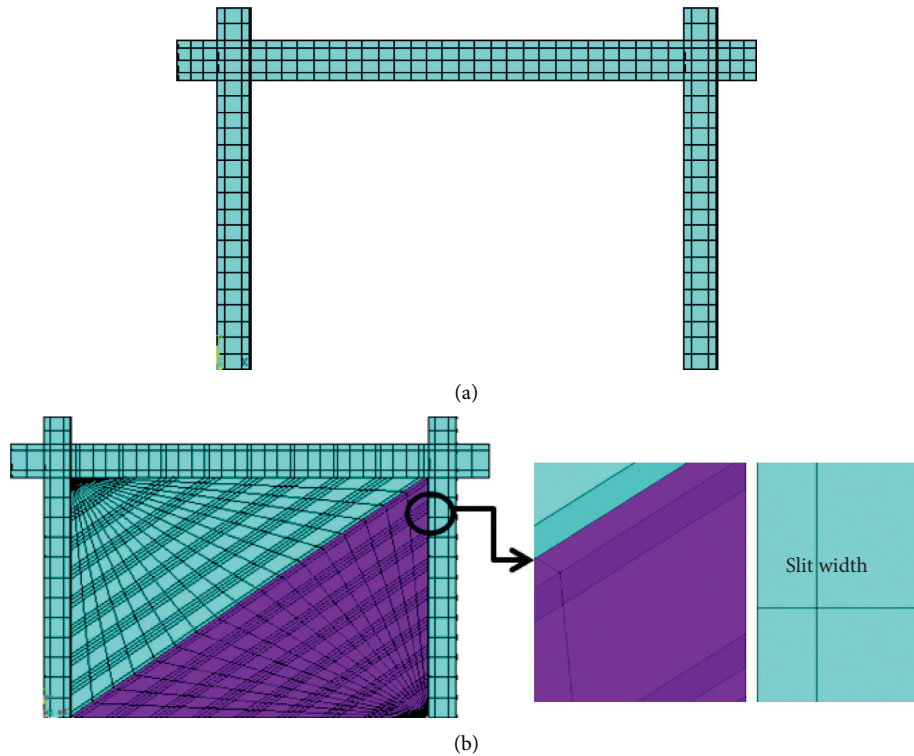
Finite element models. (a) Nonductile RC frame (ND-1). (b) Reinforced frame (ND-2) with slit width (10 mm).
